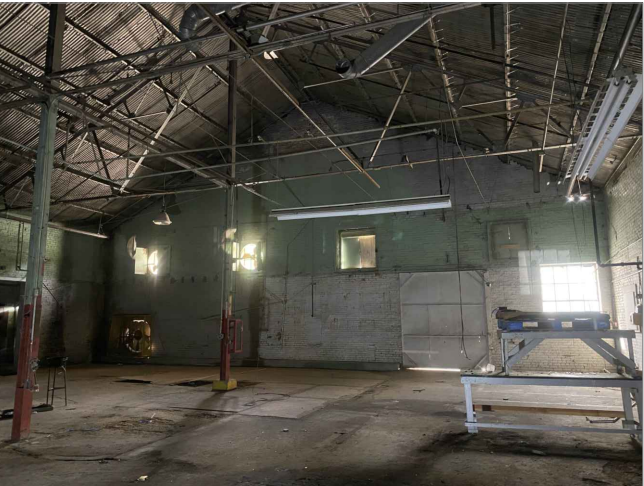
PHOTOS OF EXISTING BUILDING - INTERIOR VIEWS
